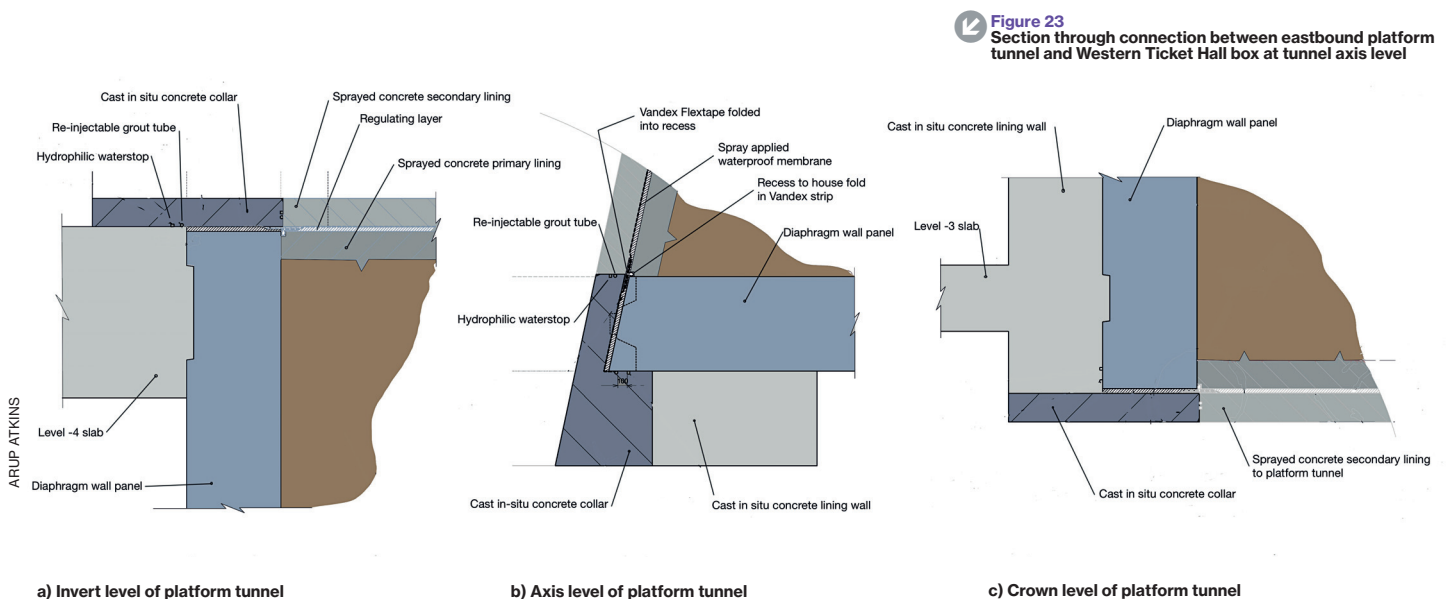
Section through connection between eastbound platform tunnel and Western Ticket Hall box at tunnel axis level
